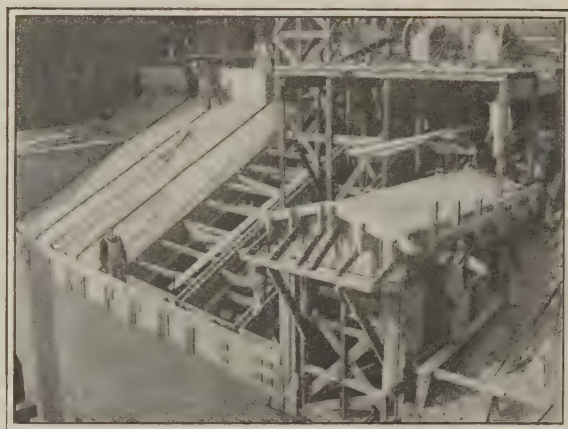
Construction of a Very Steep Roof of Reinforced Concrete.
